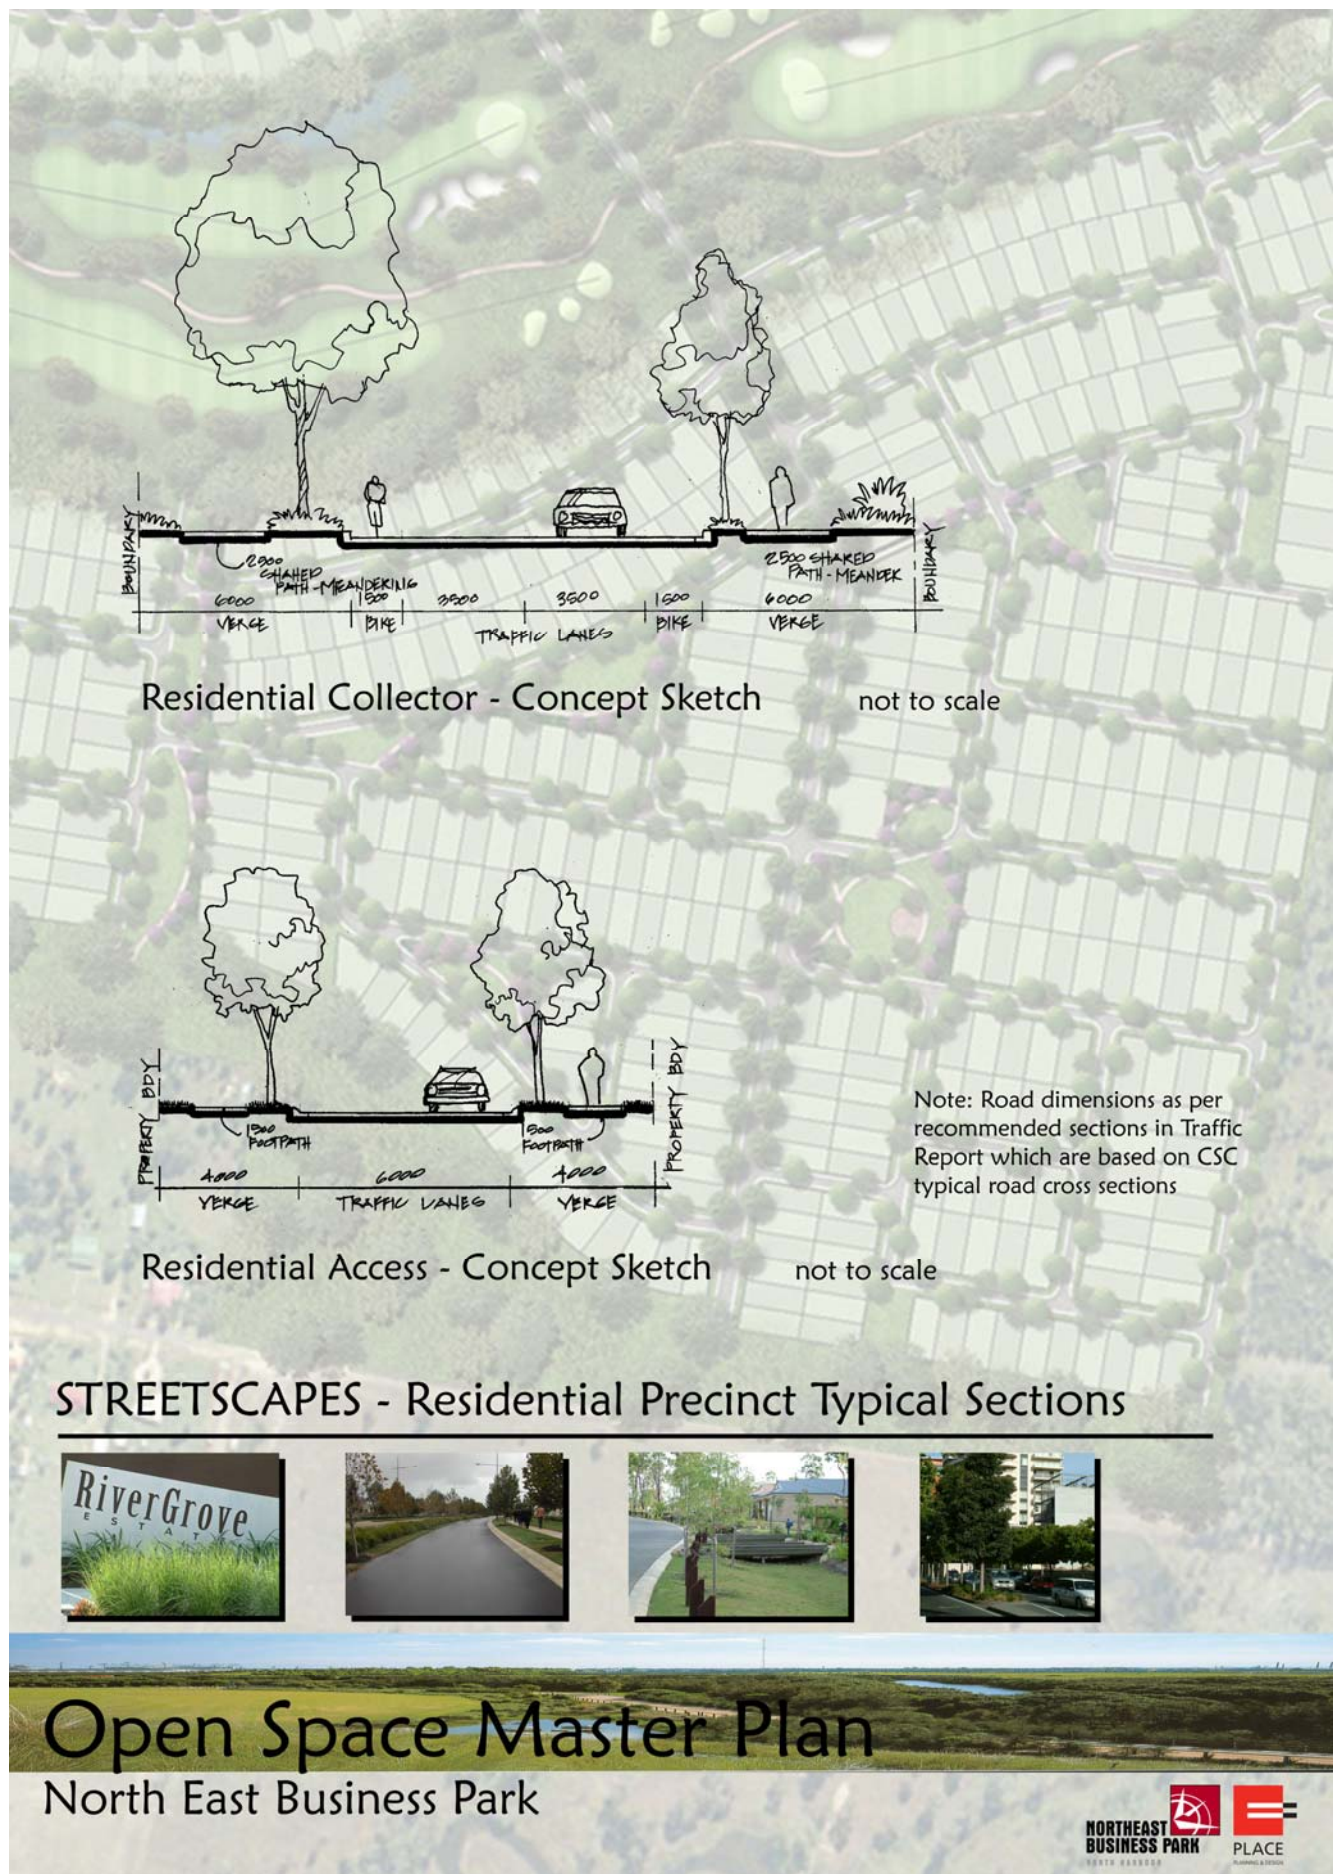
Streetscapes – Residential Precinct Typical Sections
